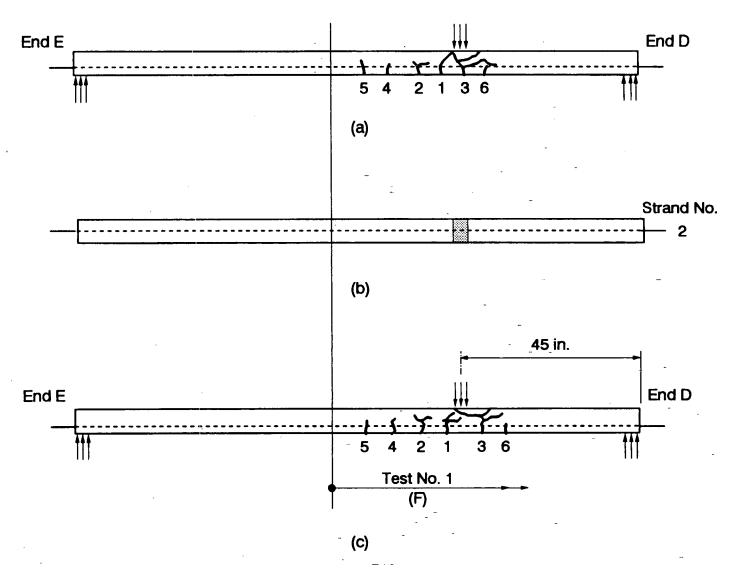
Crack pattern for D-type Specimen No. 11-6.0DU-10:
